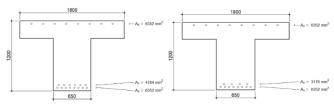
Reinforcement in span sections: section 2 (left) and section 4 (right)
